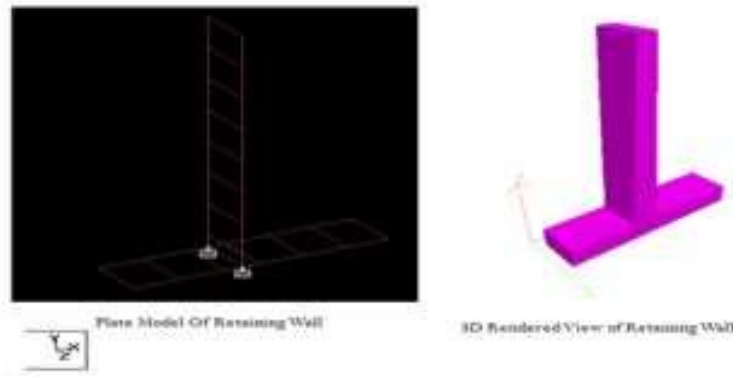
Plate model and 3-D rendered view of retaining wall
